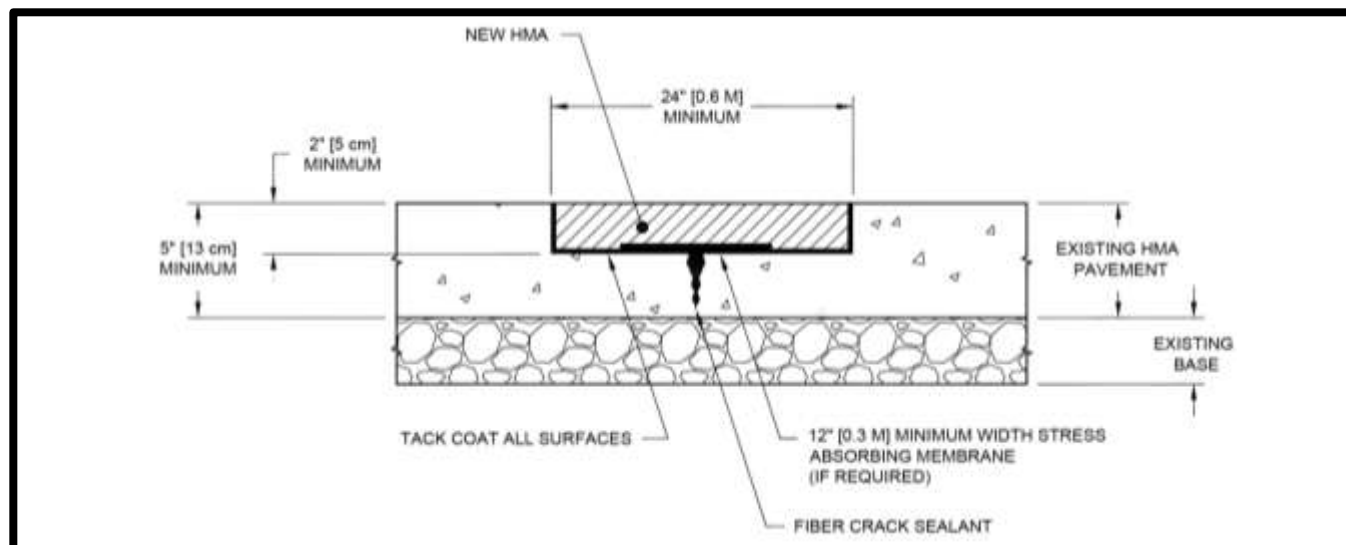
Partial depth crack repair in flexible pavement
